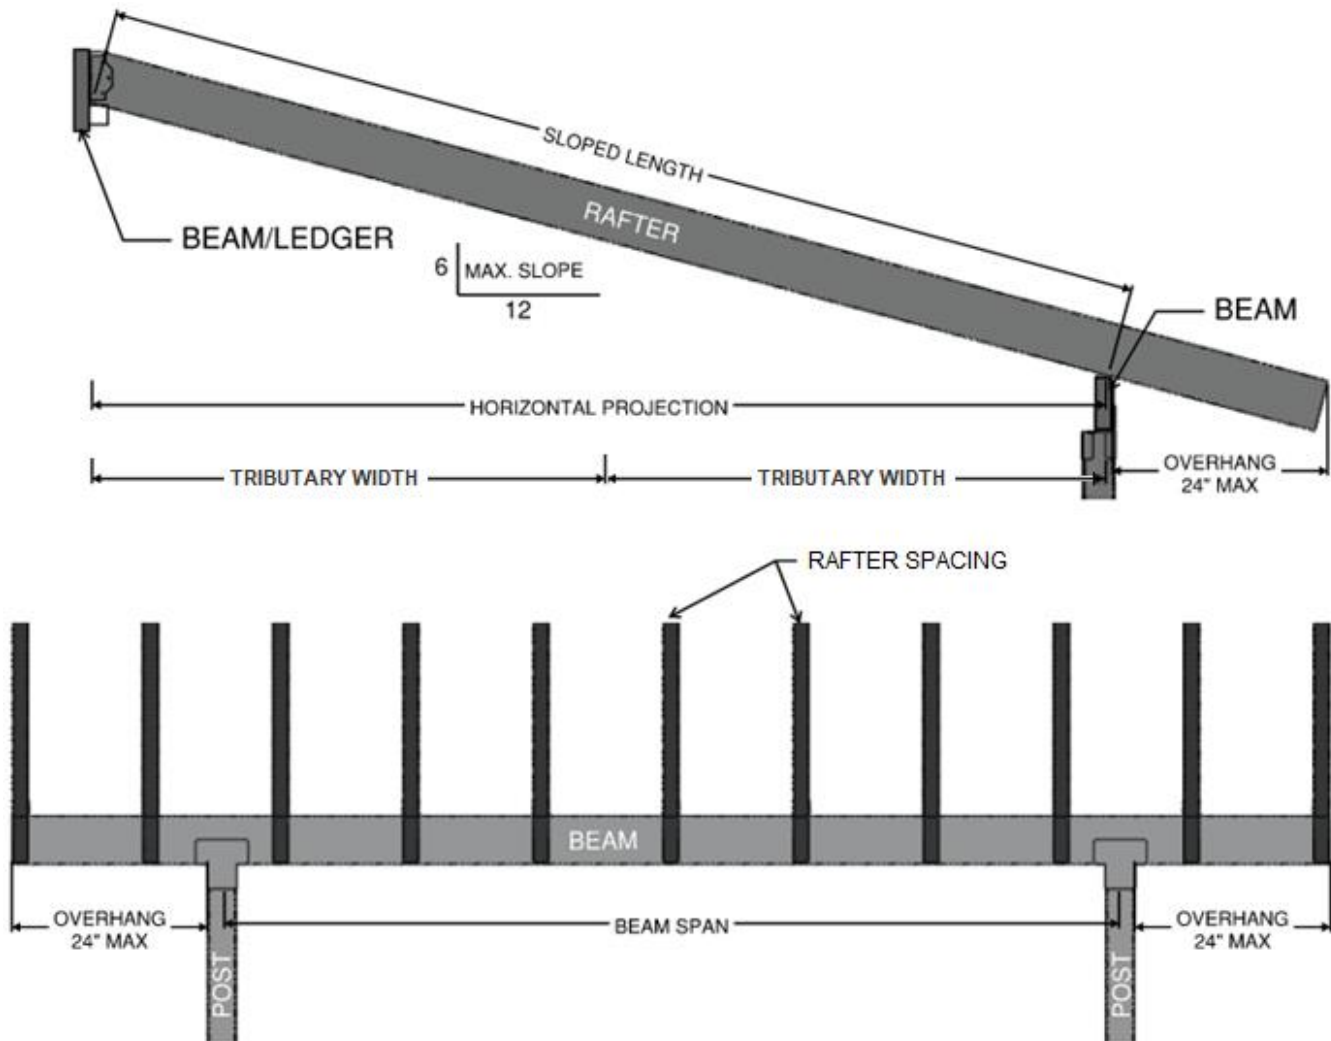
Rafter and Beam Span Definitions for Attached Sloped Roof Framing
